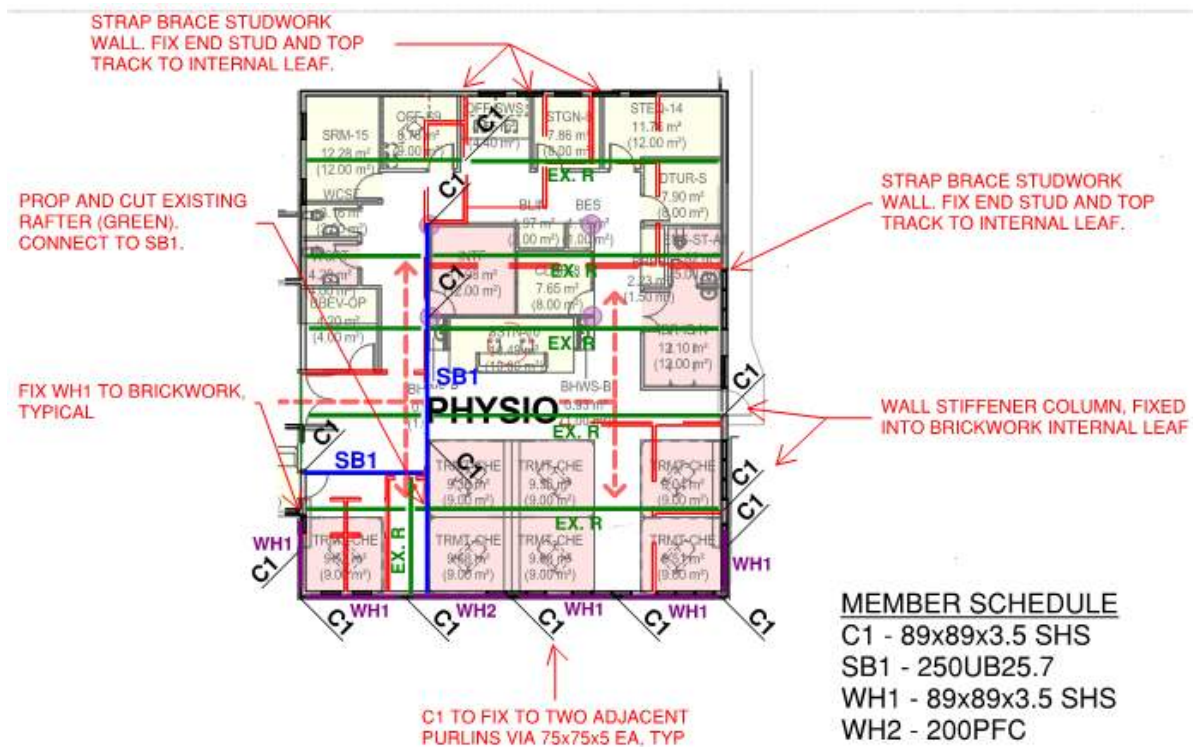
Proposed structural layout showing location of existing rafters and extent of existing masonry walls to be demolished.
